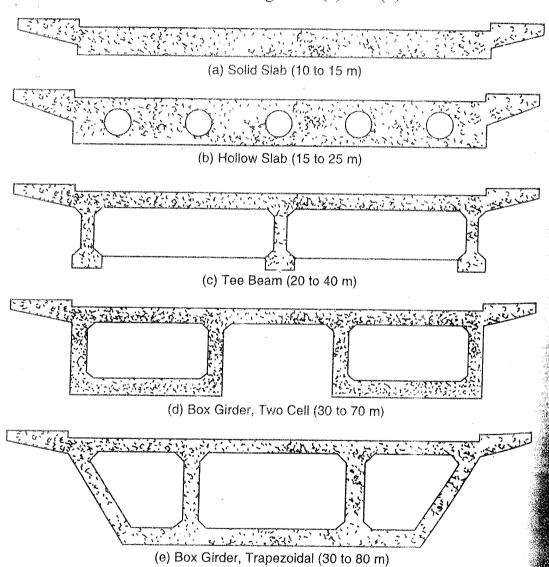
Typical Cross Sections of Post-tensioned Prestressed Concrete Bridge Decks.
